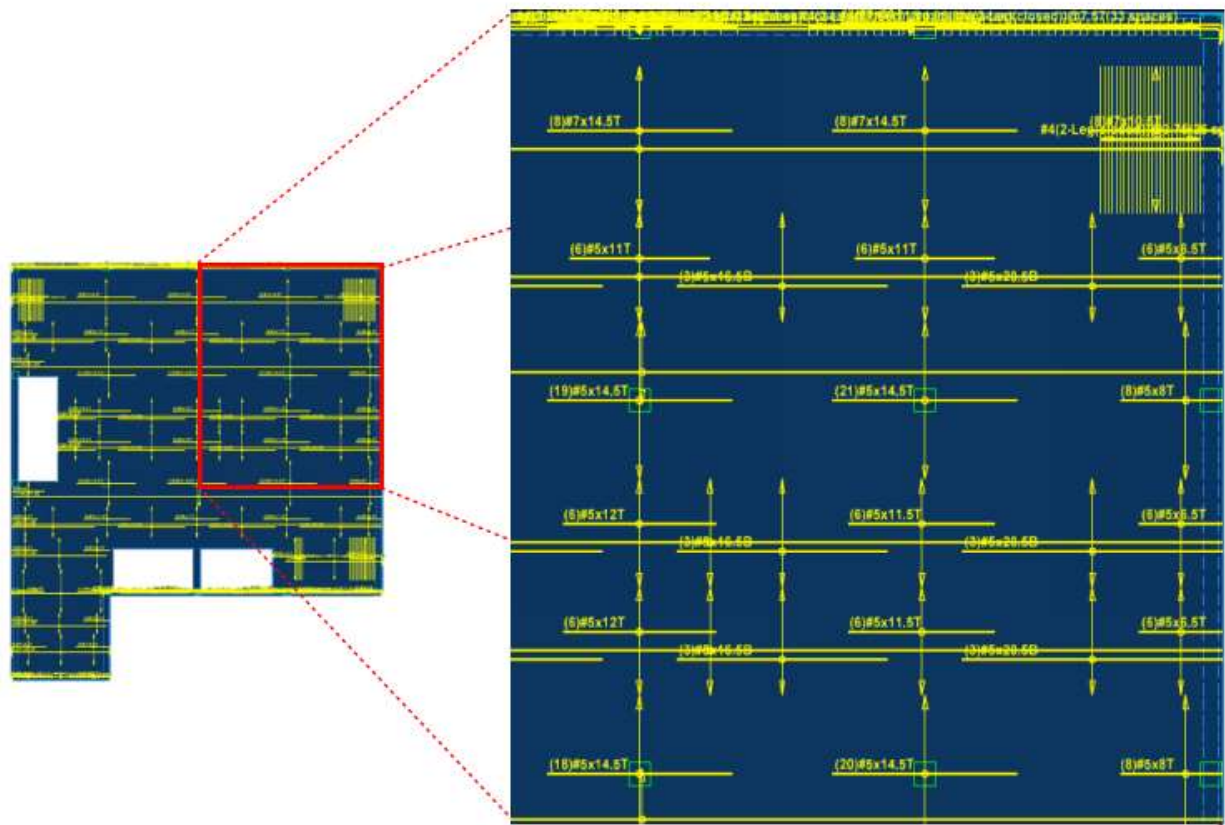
Flexural Reinforcement Plan (RAM Concept)
